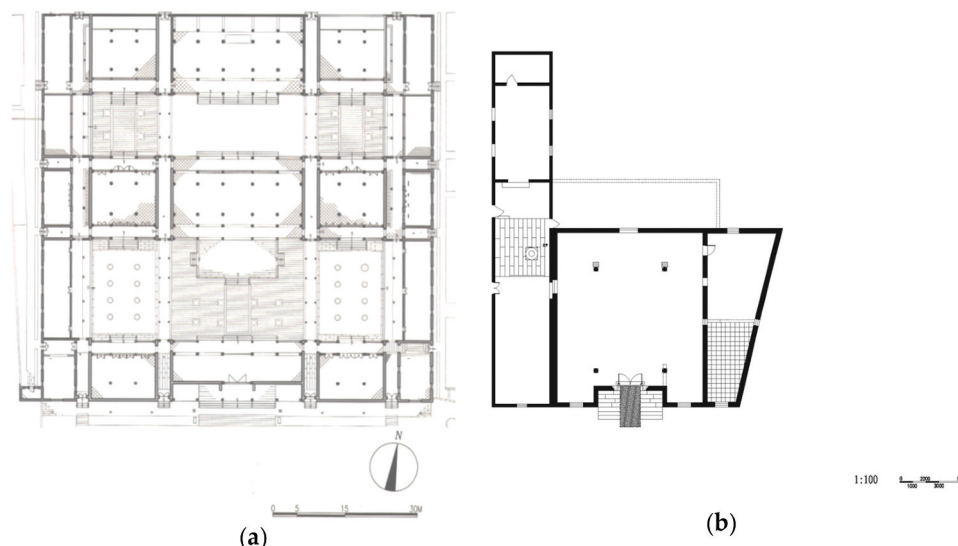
(a) Structure plan of Chen Clan Academy; (b) Shangshudi house in Daqitou.
